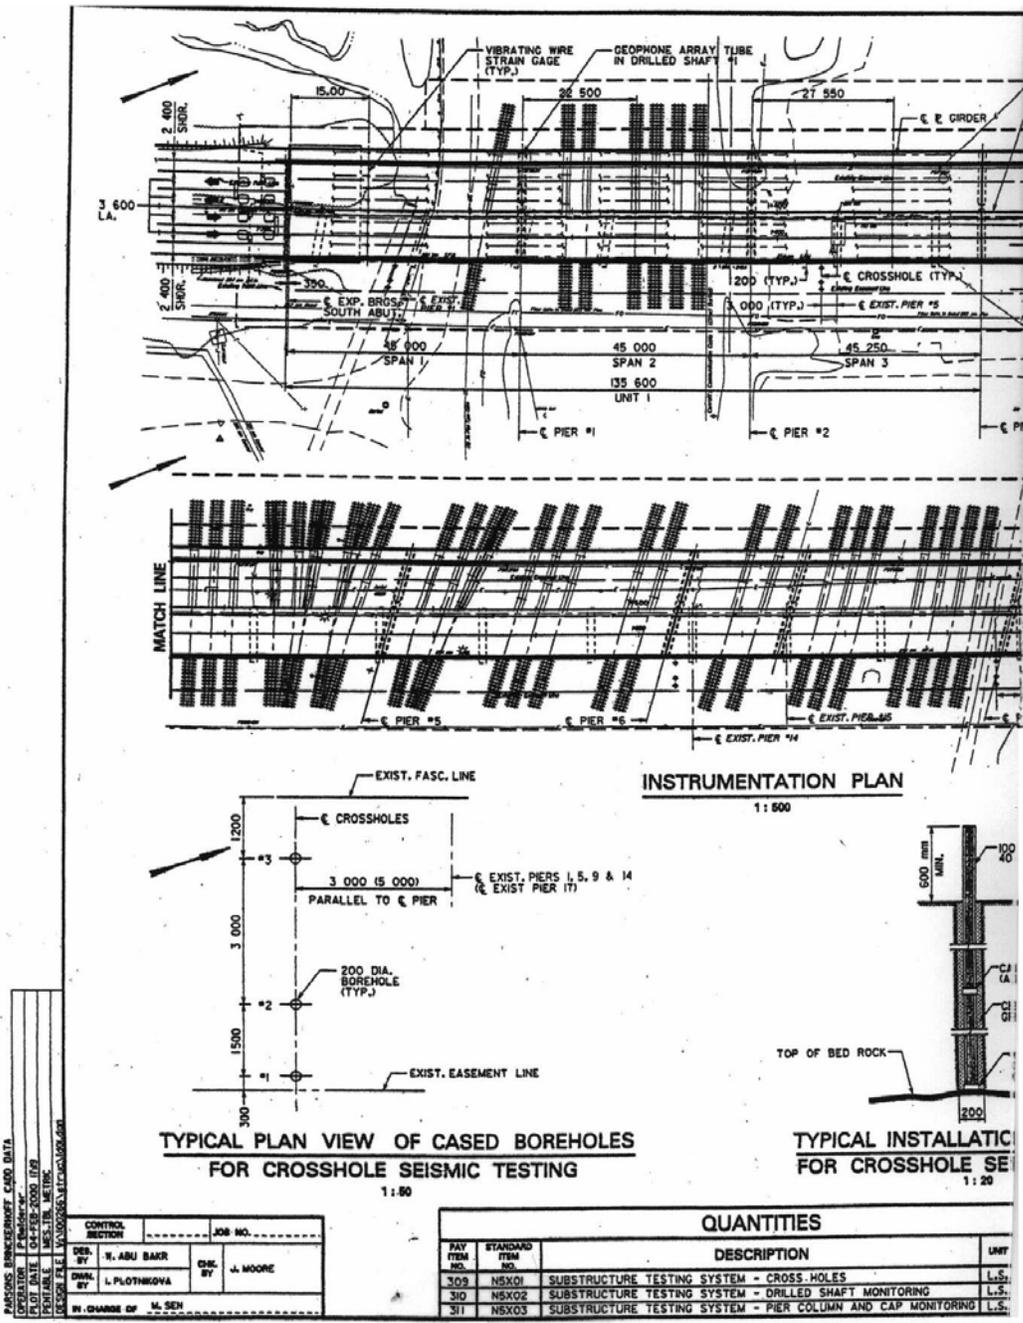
Instrumentation details of VWSG of the Doremus Avenue Bridge.
